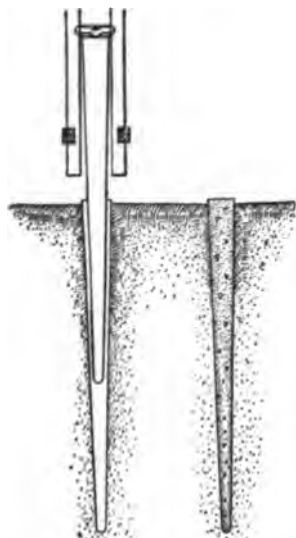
Raymond pile core collapsed and partly withdrawn. Completed Raymond pile without reinforcement.
